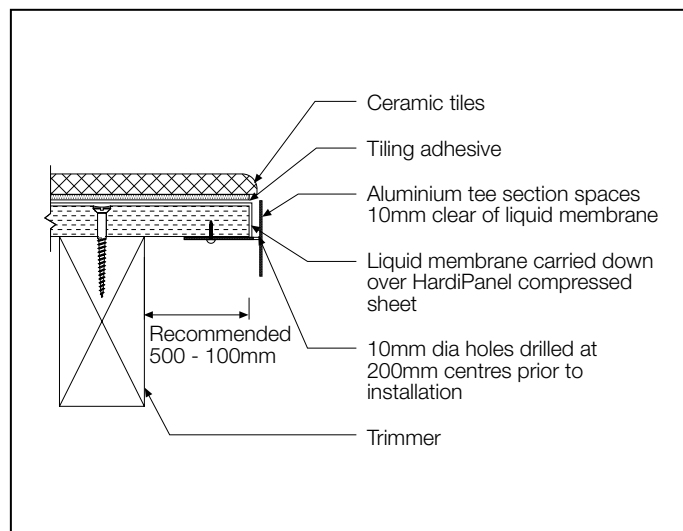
METHOD 2 - DECK EDGE DETAIL USING ALUMINIUM TEE SECTION
